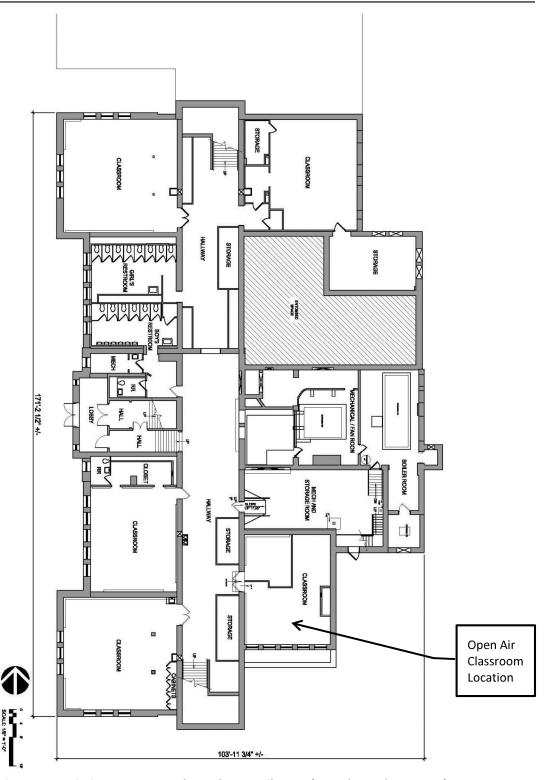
Existing Basement Floor Plan, April 2013 (Foutch Brothers 2013)
